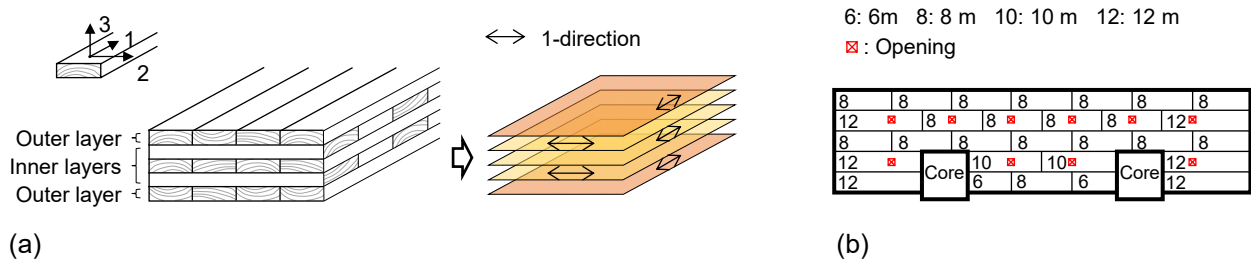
Modelling of CLT panels: (a) Layered shell model, (b) Arrangement of CLT floor panels.
